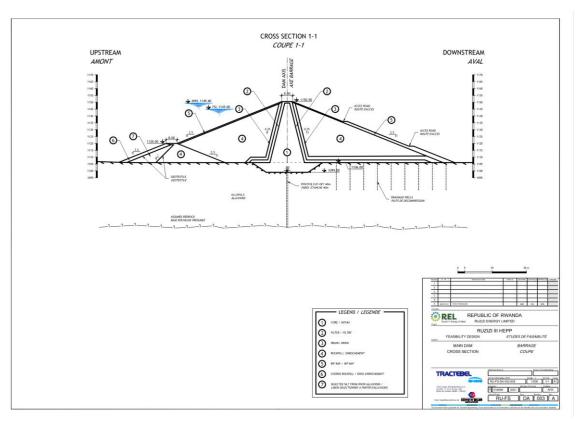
Dam Design Drawings: Cross Section 1-1
